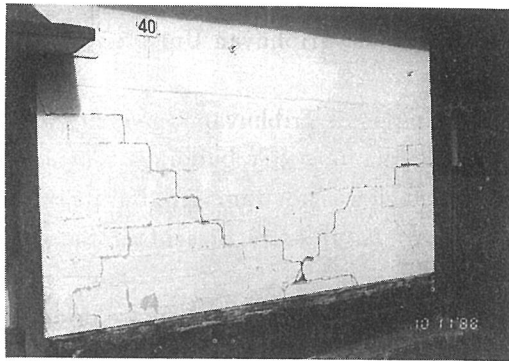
Damage to a single-story block building in the British Recruit Camp, Dharan Bazaar, Nepal
